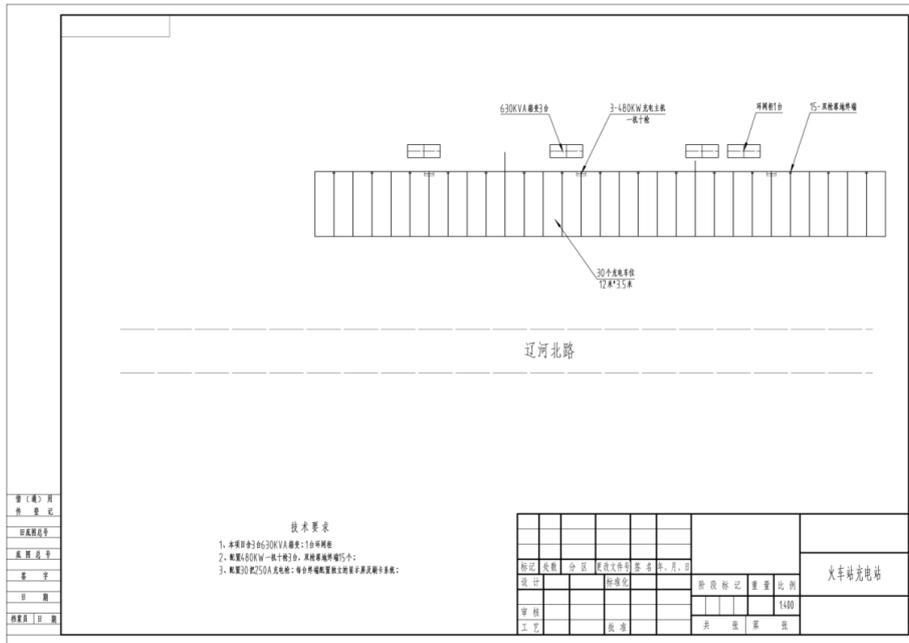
Layout of charging piles in the parking lot of Panjin Shuangtaizi Railway Station
